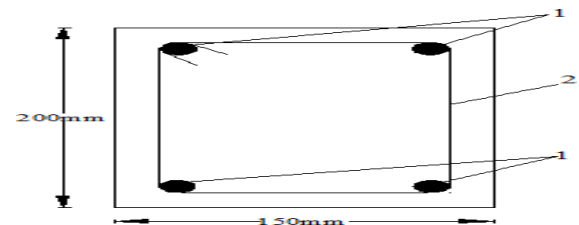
Cross section: 1 – Longitudinal rebars, 2 – close stirrups
